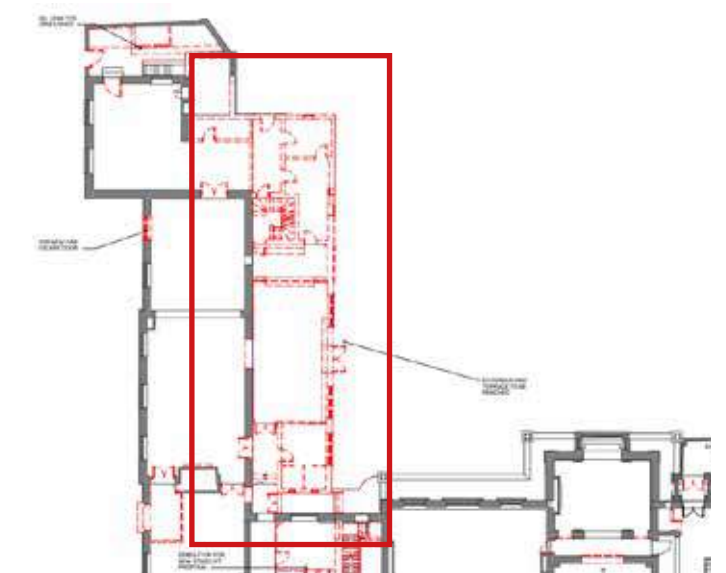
Existing plan of the Hall with the existing detractive addition to the west wing highlighted in red
